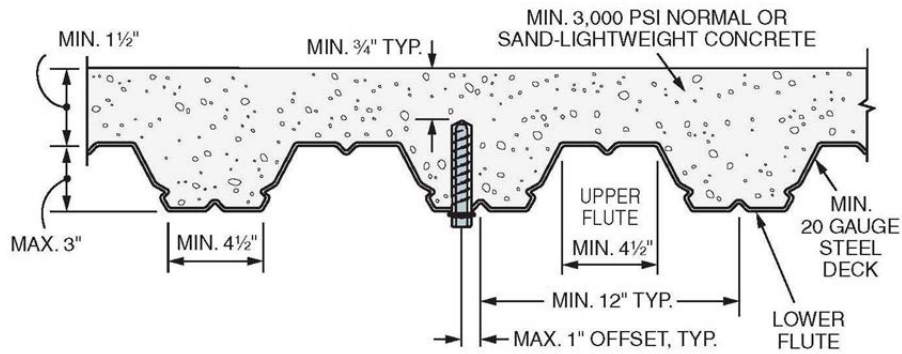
INSTALLATION IN THE SOFFIT OF CONCRETE OVER PROFILE STEEL DECK FLOOR AND ROOF ASSEMBLIES (LOWER FLUTE)
